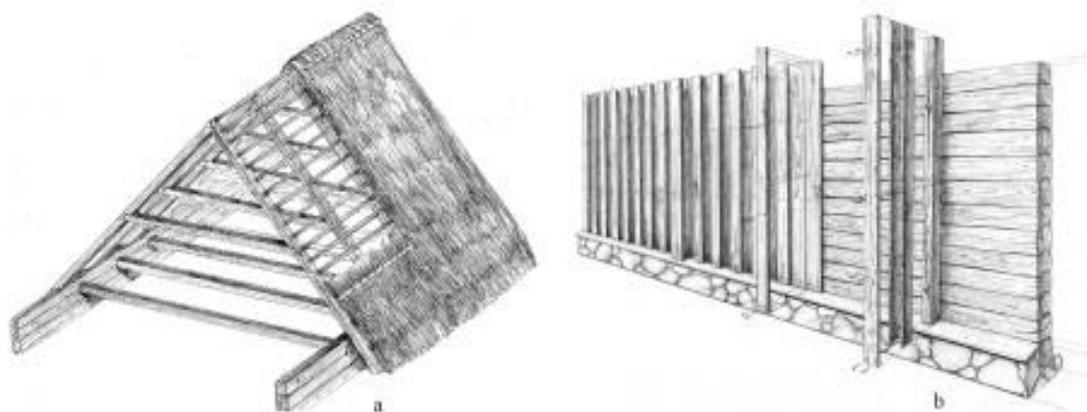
a) Roof structure covered with a mantle of sheafs of wheat; b) External walls covering.
